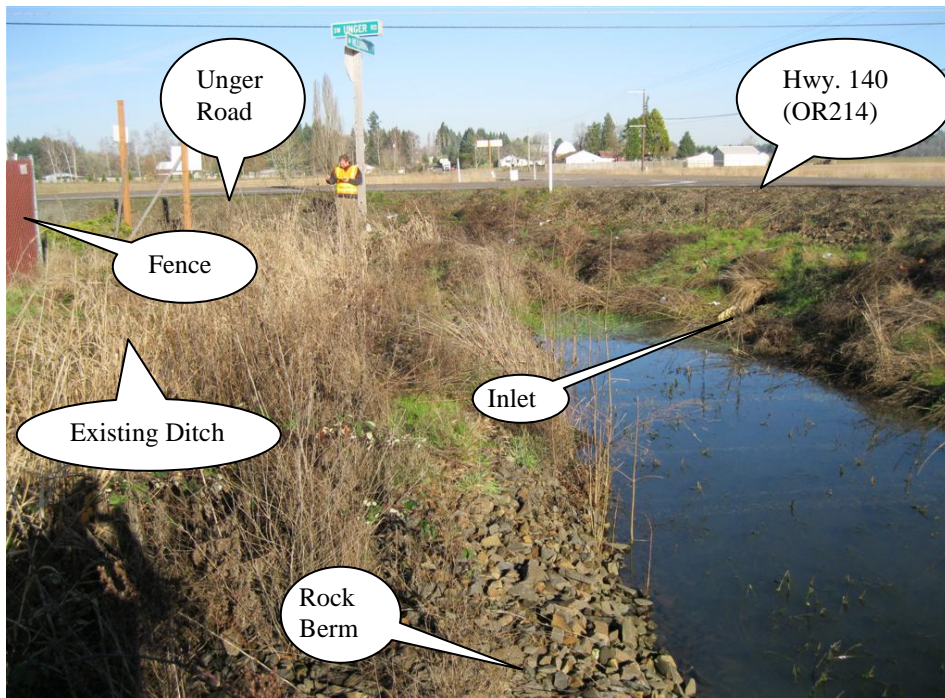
Facing north, shows the inlet and the how the ditch runs adjacent to the swale.
